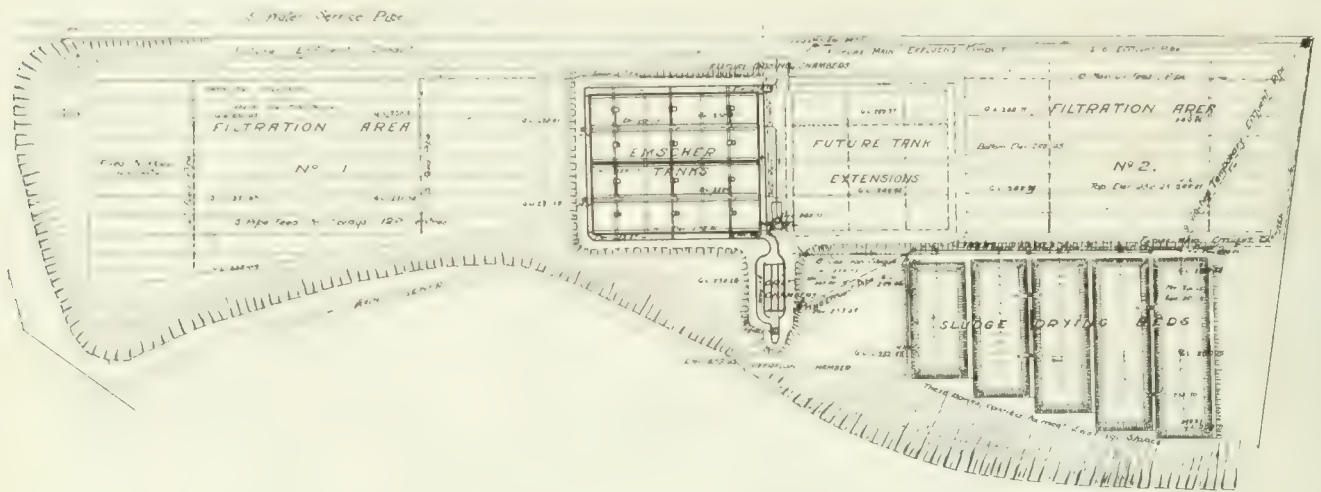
General Layout of West End Disposal Works, Hamilton.
